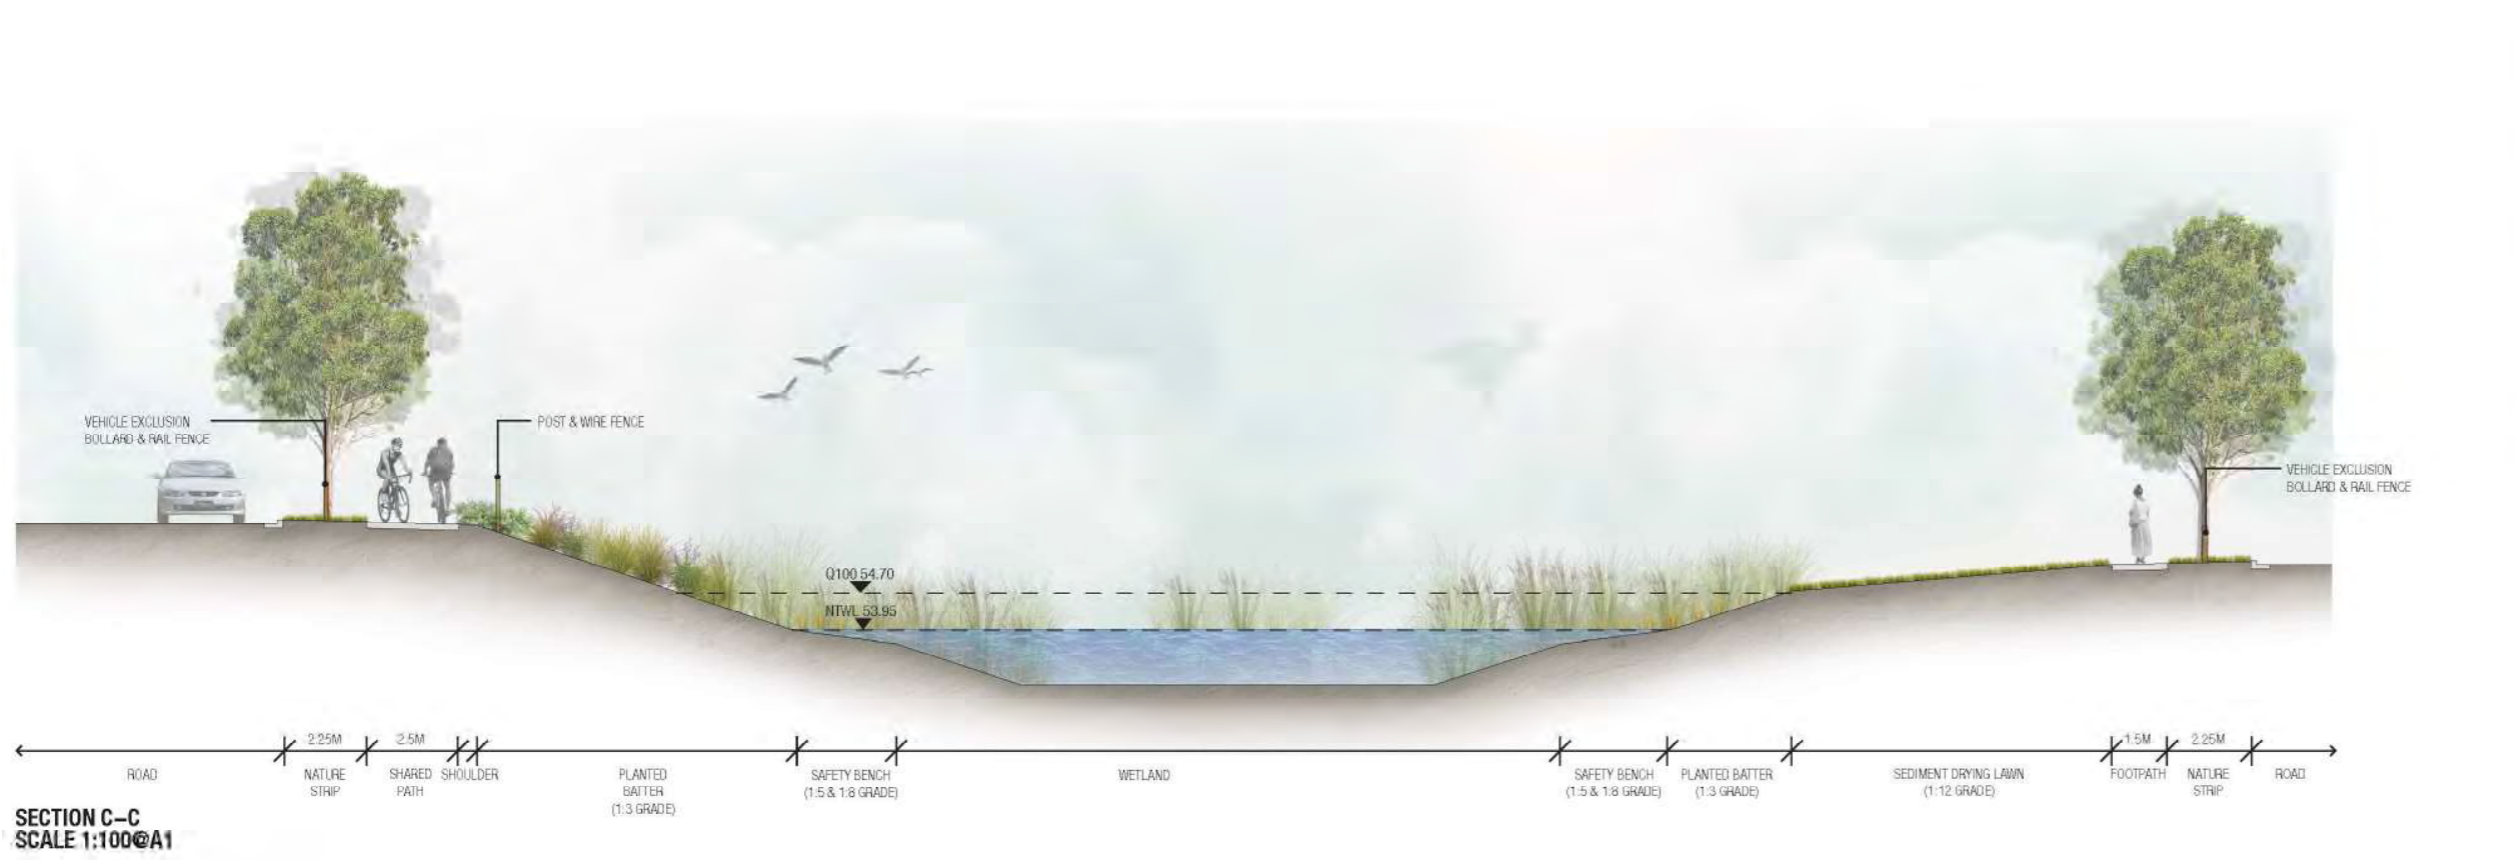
Revised Wetland/Waterway landscape concept - Sections (MDG Landscape Architects, 05.04.2024)
